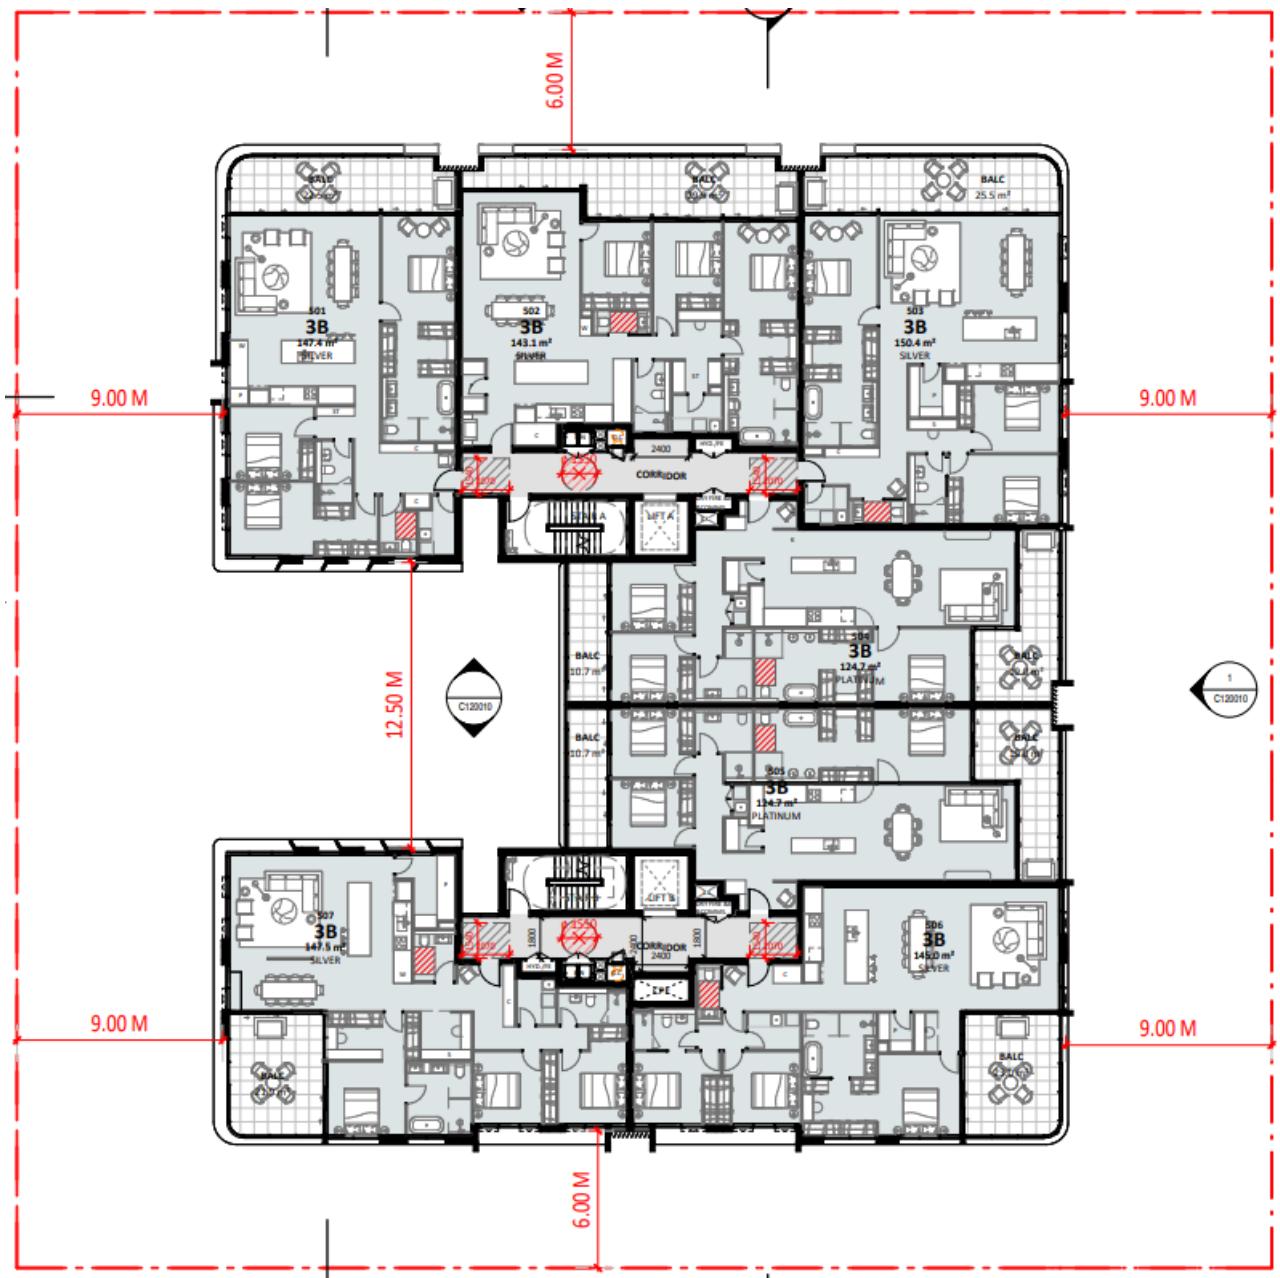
Proposed Level 4-6 Plan showing setbacks (Source: PTW)
